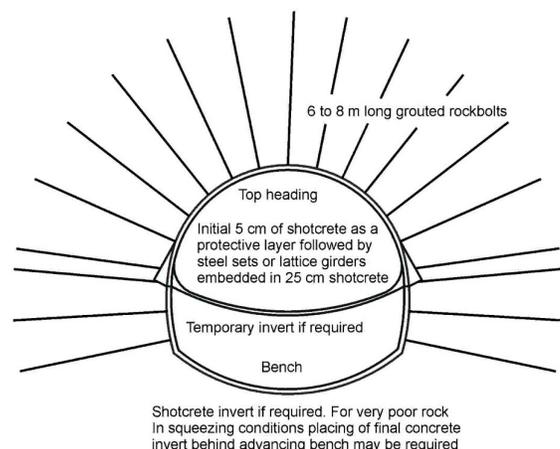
Typical primary support design for broken molassic rocks with frequent and well defined discontinuities, mainly bedding planes. A final concrete lining (not shown) is placed later.
